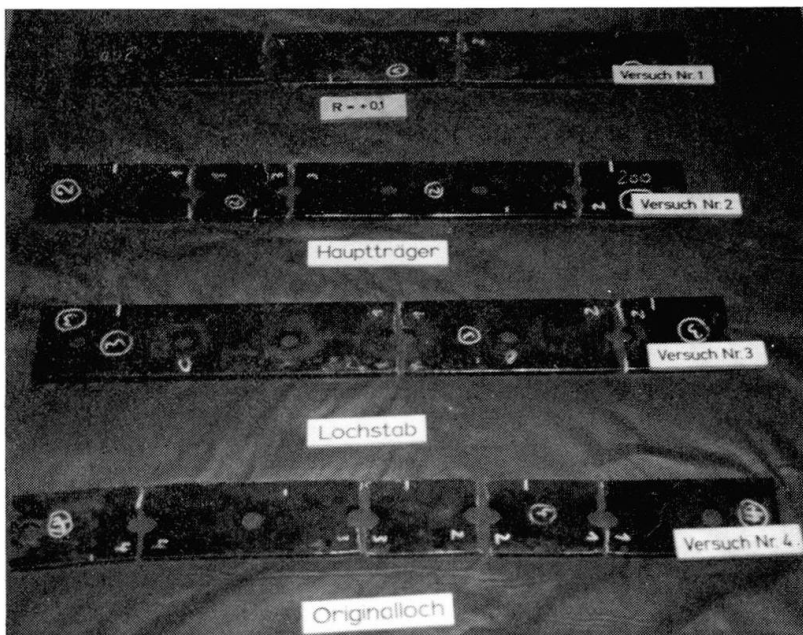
Specimen after failure (punched specimen from Stahringen bridge)
